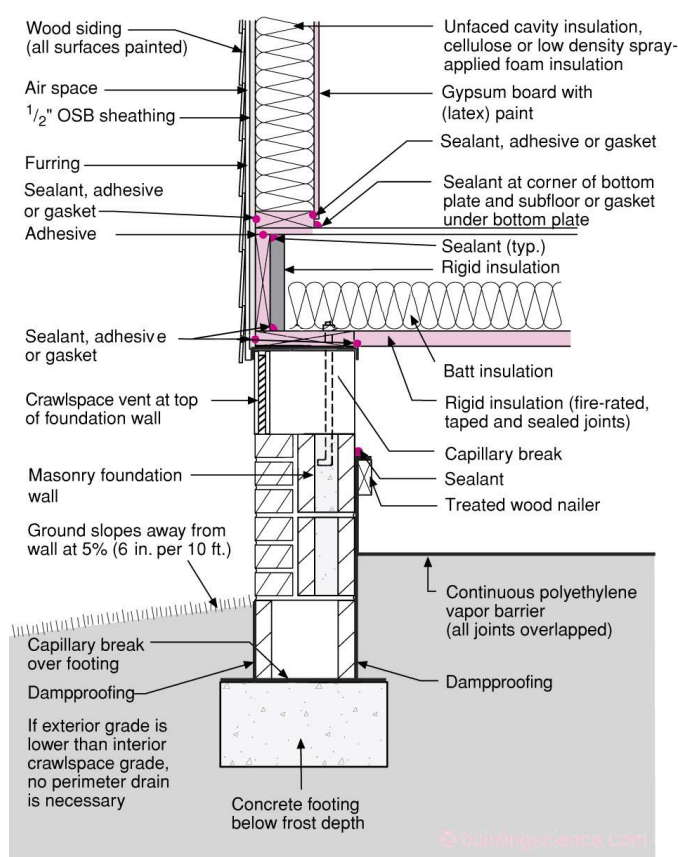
Crawlspace Perimeter – It is necessary to connecting the underside of the crawlspace floor framing through the perimeter rim joist area to the exterior wall assemblies in an airtight manner.
